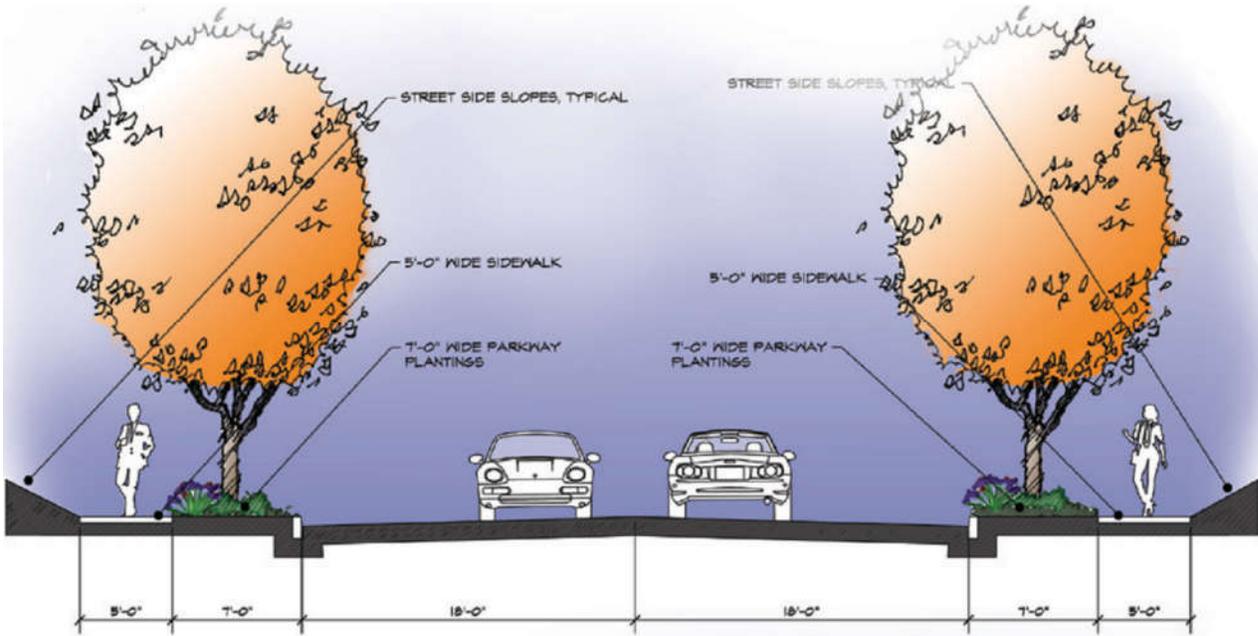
CONCEPTUAL LEMON STREET LANDSCAPE SECTION
